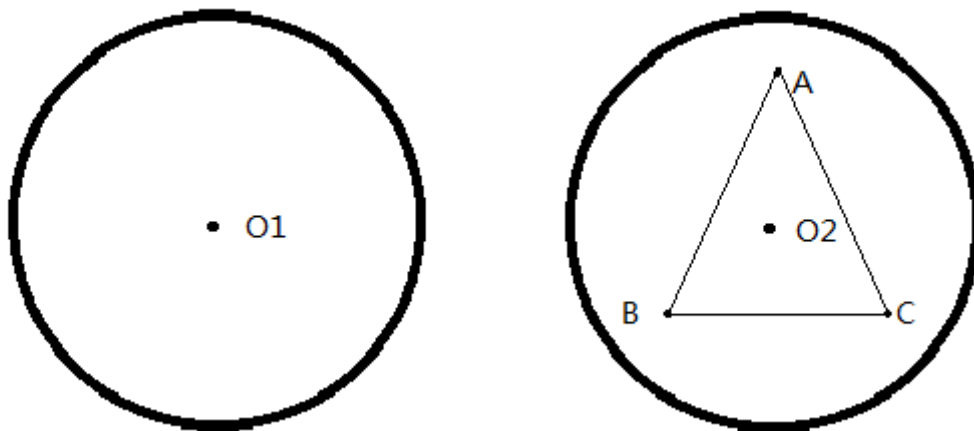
plan sketch of shield's head Fig 2. plan sketch of shield's tail
